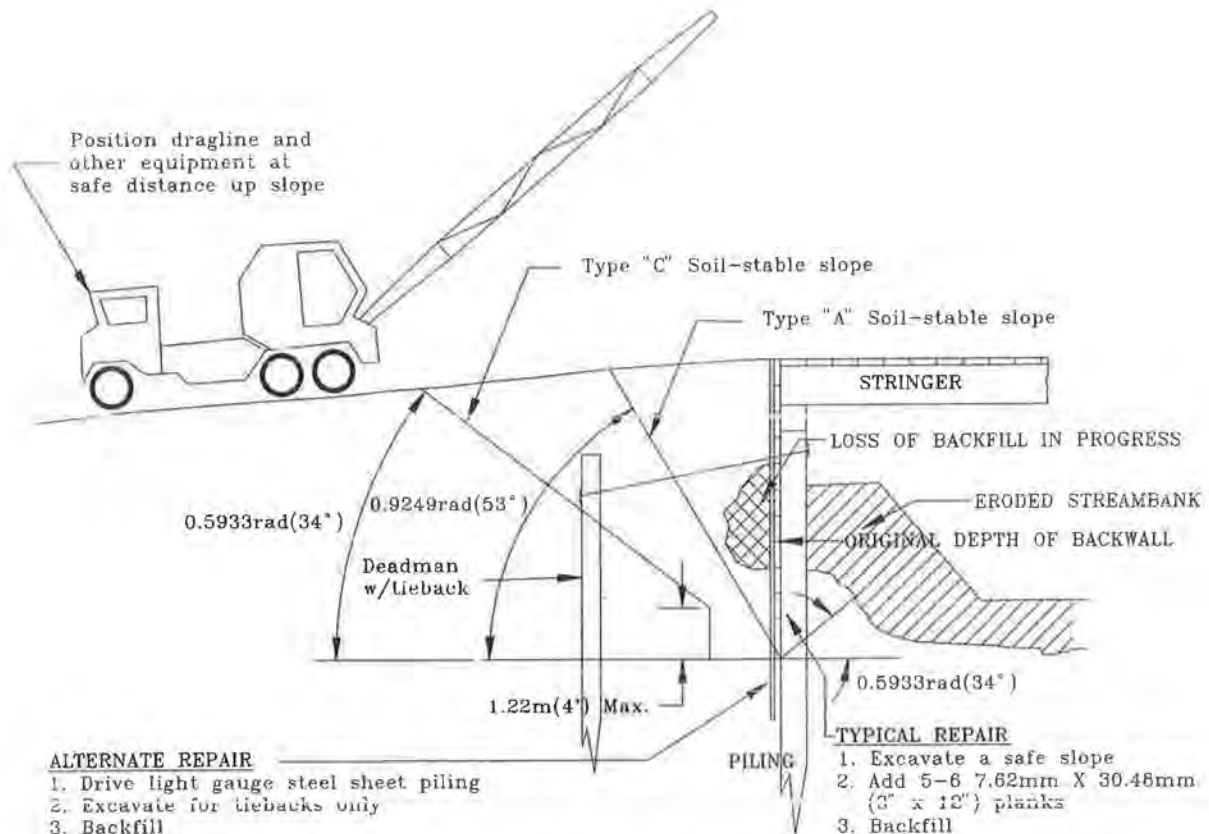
Typical timber bridge abutment: descriptions of and pertinent items relating to bridge backwall repair.
